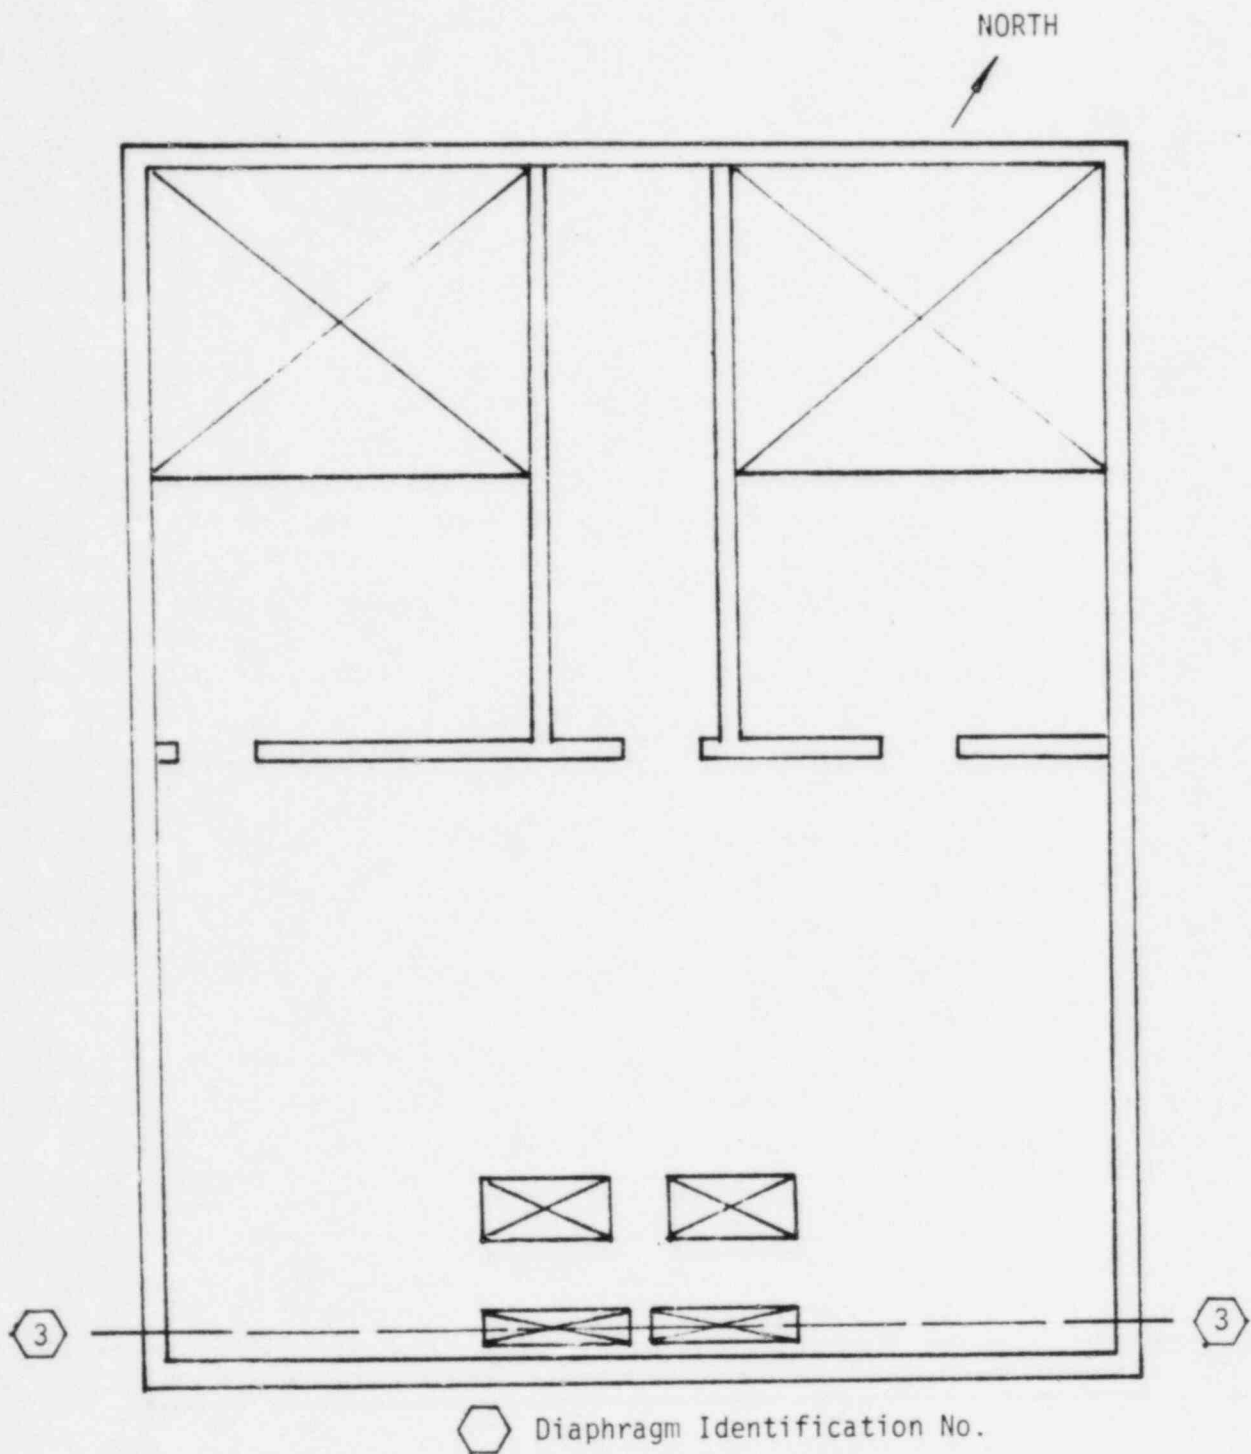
SERVICE WATER PUMP STRUCTURE FLOOR SLAB
